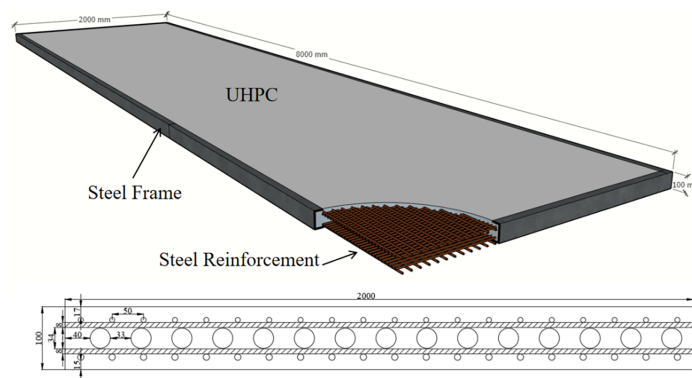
Configuration of steel frame-UHPC composite deck (Unit: mm).
